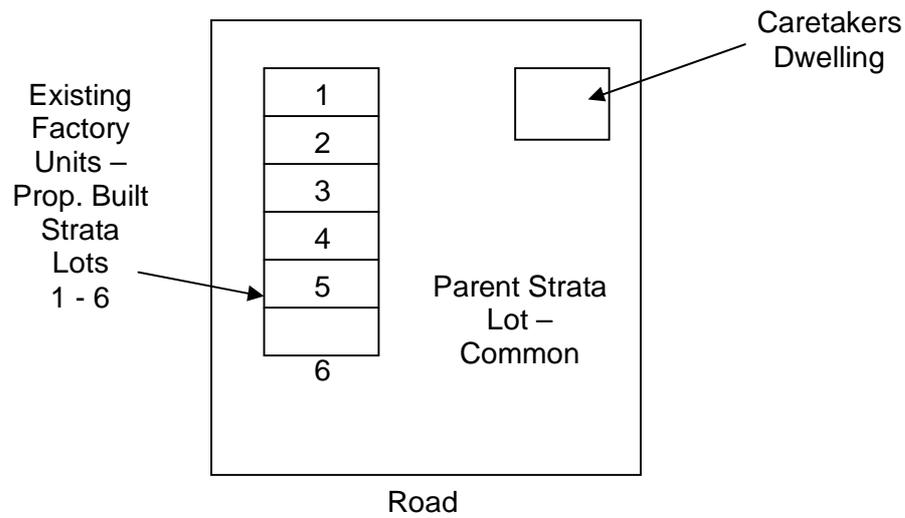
Proposed Built Strata Subdivision – only one caretaker’s dwelling
